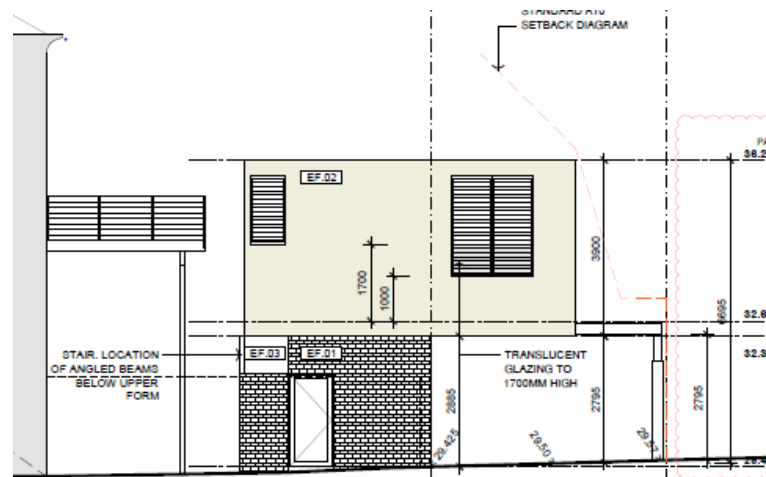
Sketch plan east elevation showing 0.85m separation to balcony edge.
